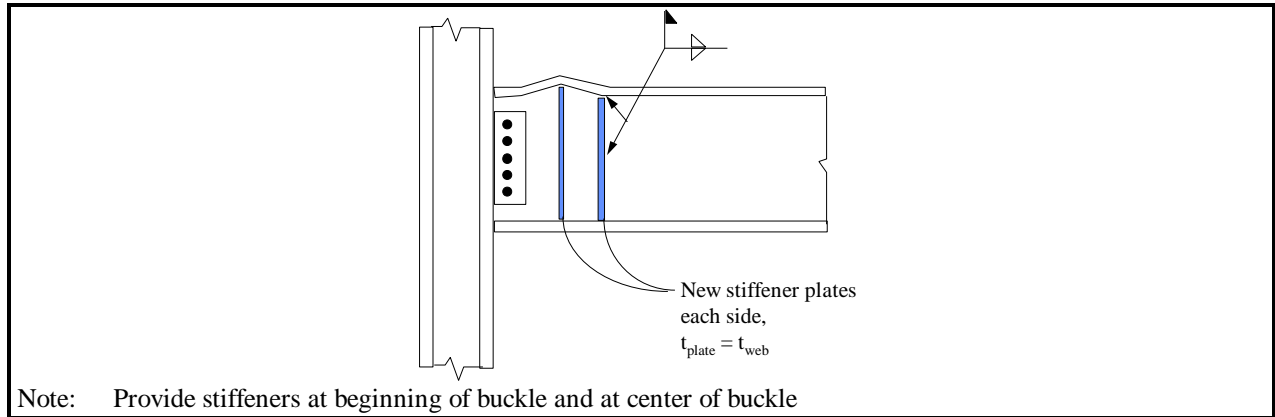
Addition of Stiffeners at Buckled Girder Flange
